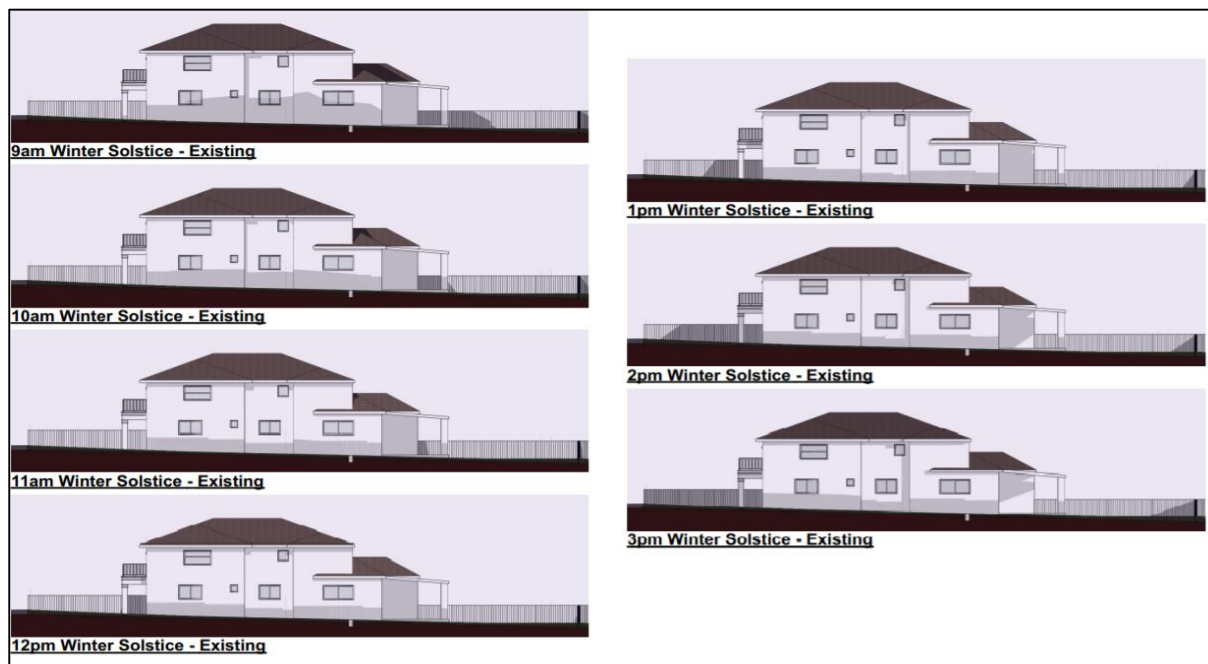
Shadow on elevation diagram demonstrating existing overshadowing to 33 Rickard Road during winter solstice.
